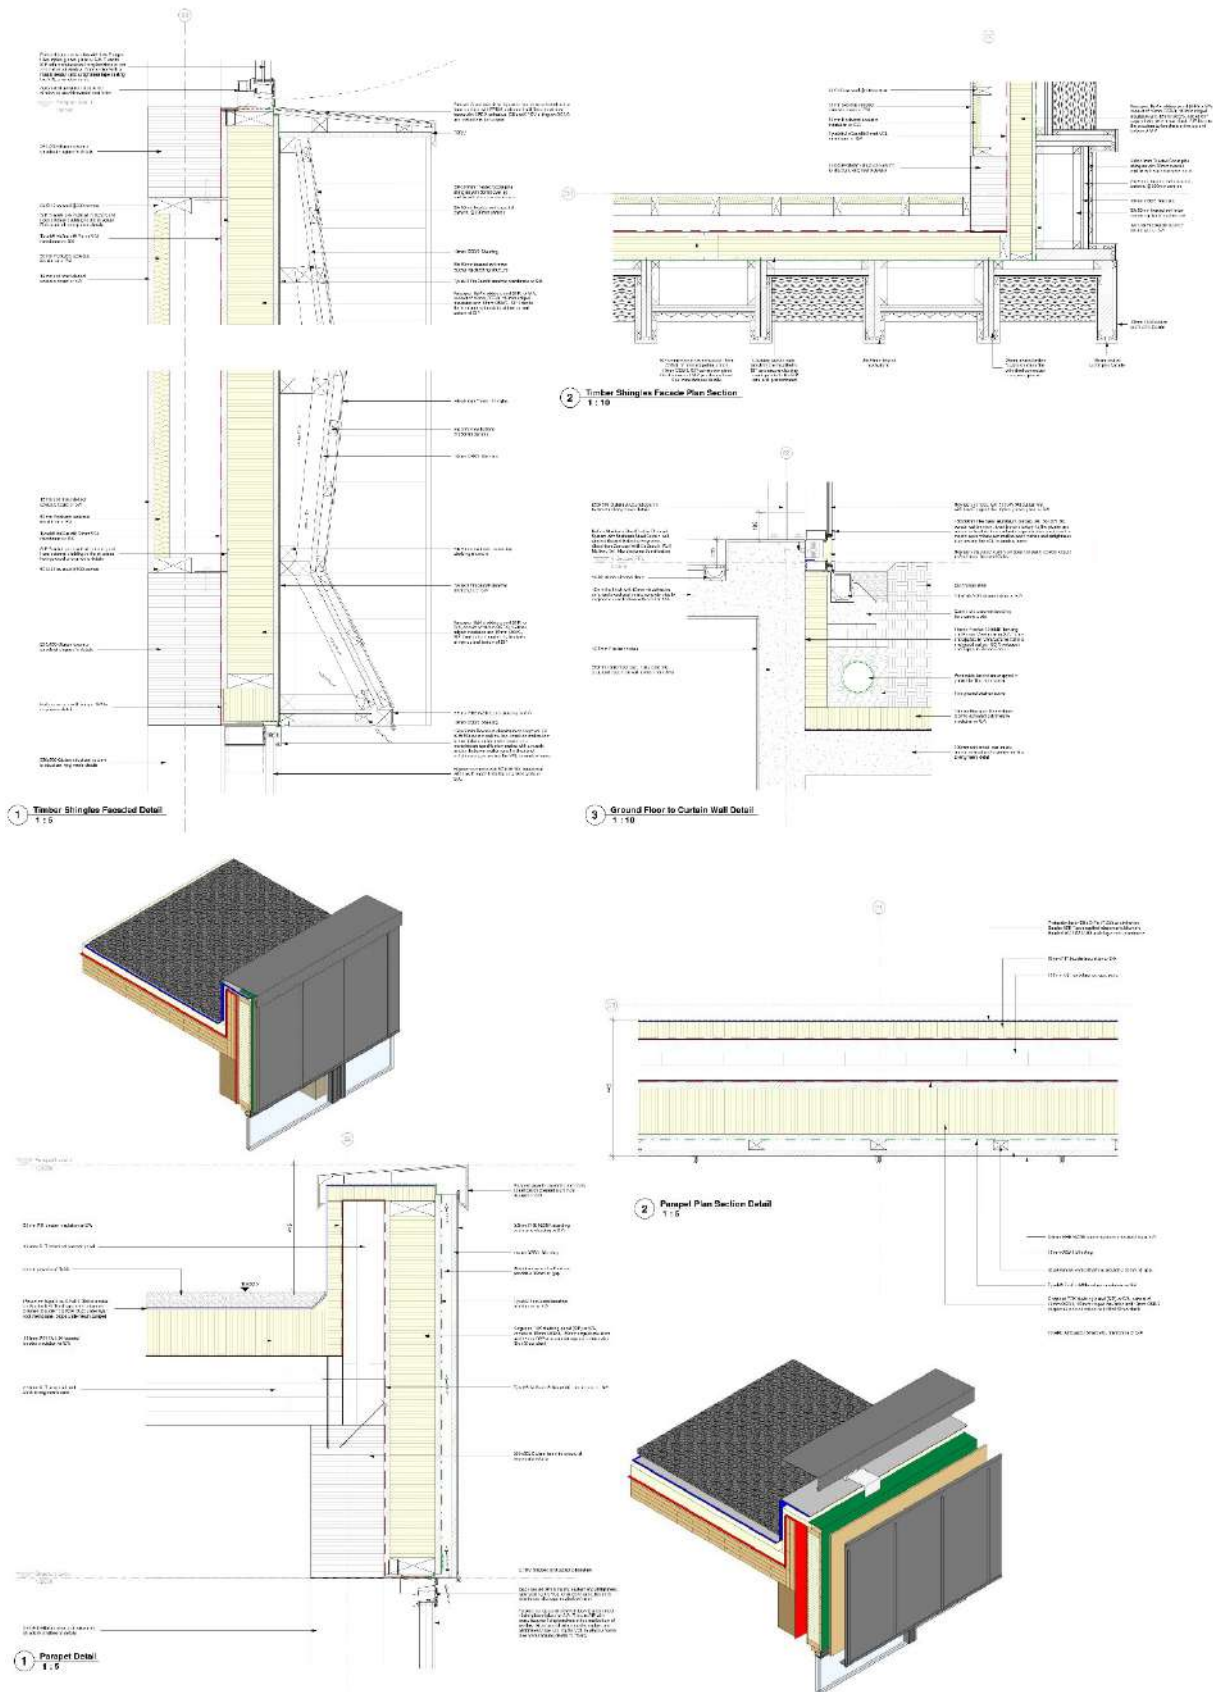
External Envelop & Parapet Details (2D/3D)
